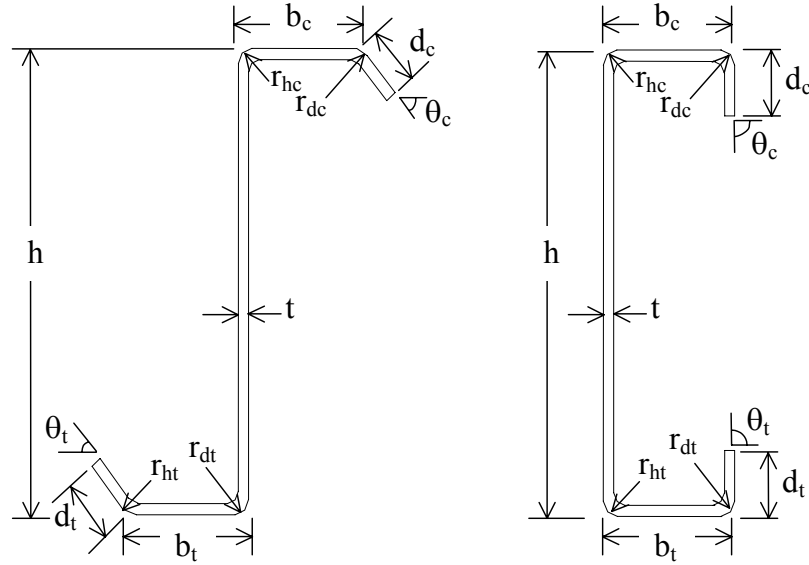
Definitions of specimen dimensions for C and Z-section
